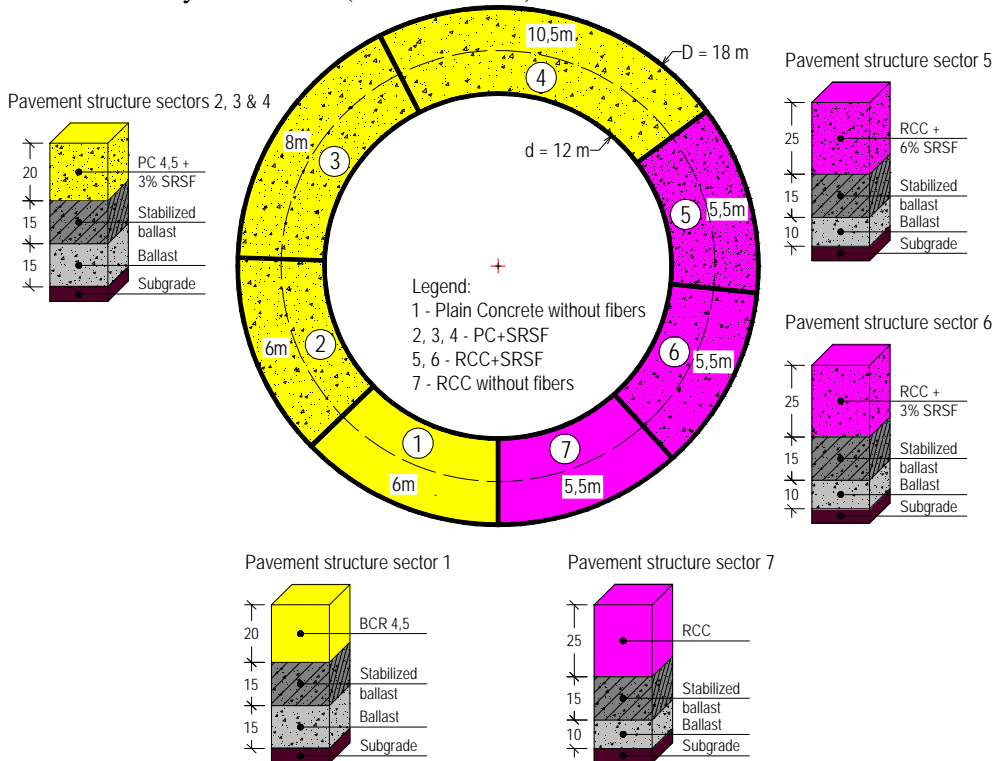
The pavement structures constructed on the ALT-LIRA facility
